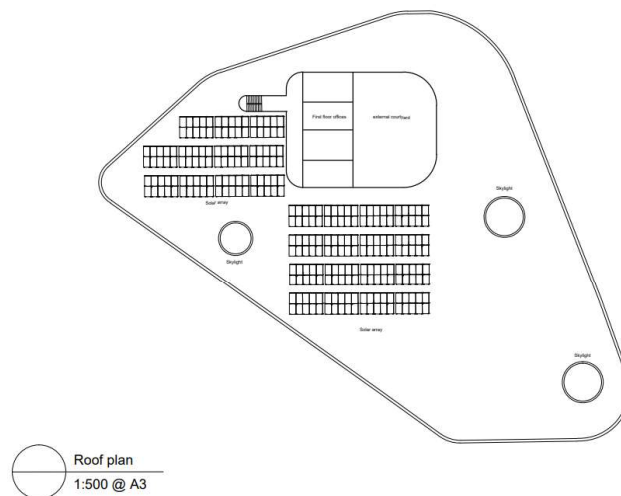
Roof Plan of Proposed Watersports Facility and Cafe
